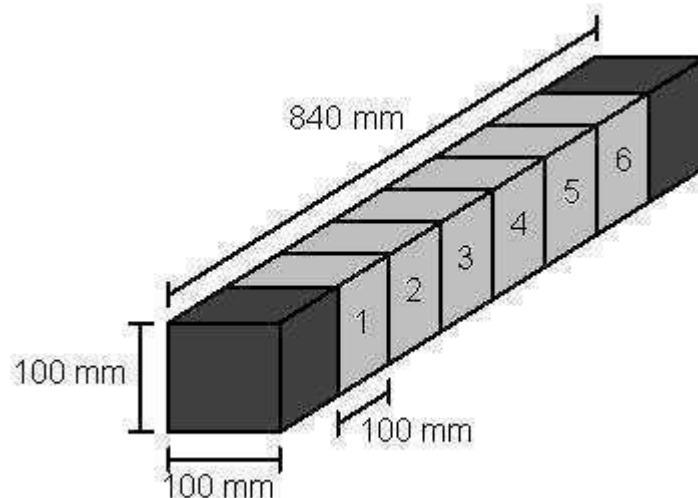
Cutting of specimens from cast concrete beams.
